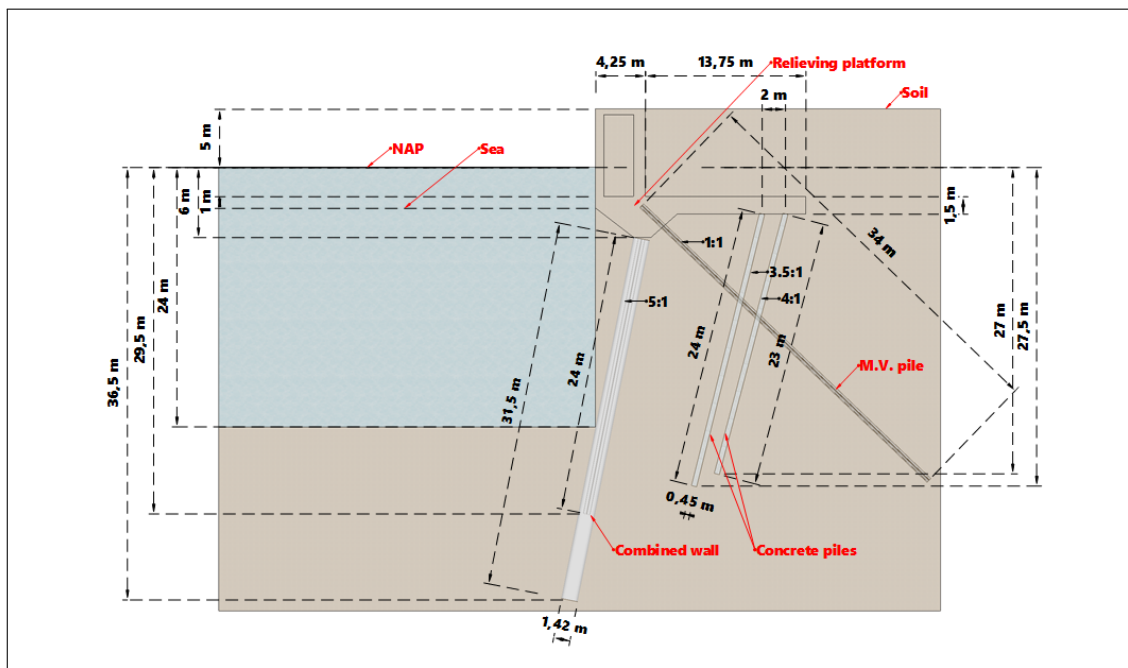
Cross-section Amazonehaven quay wall, used SketchUp
